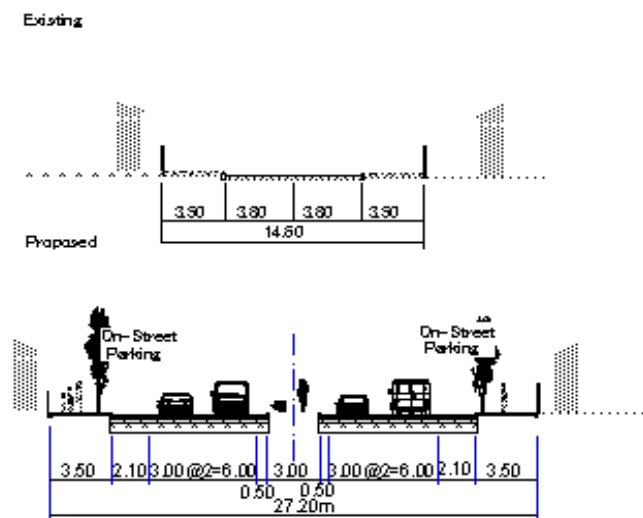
Proposed Cross Section for Rua Yamada
